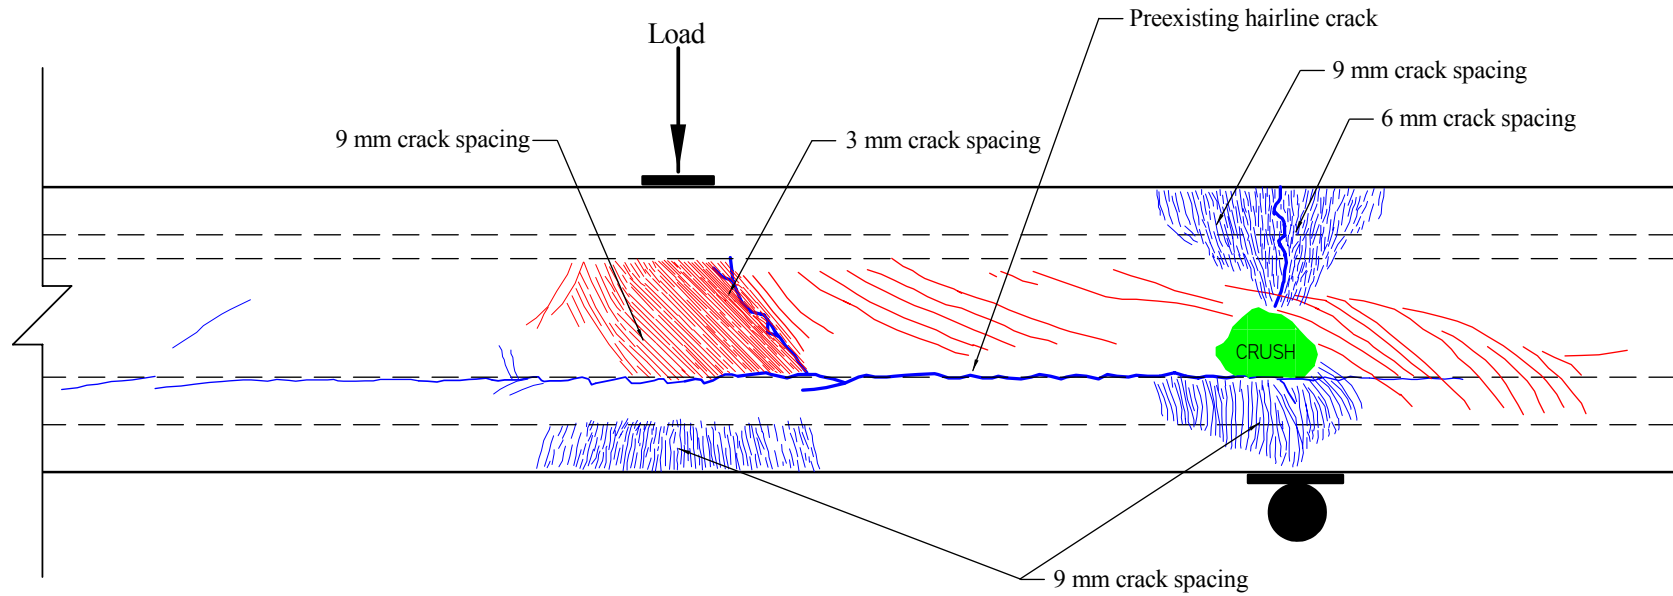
J: Tension failure of top flange and crushing of web at conclusion of test
